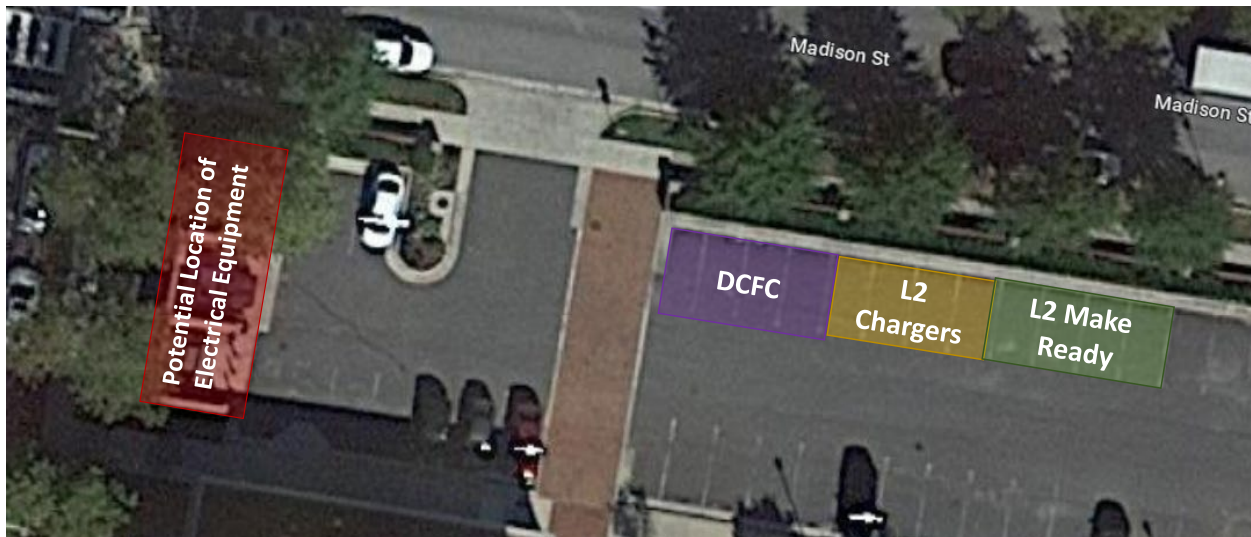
Proposed Charles Houston Recreation Center Charging Installation Site Plan (Not to scale)
